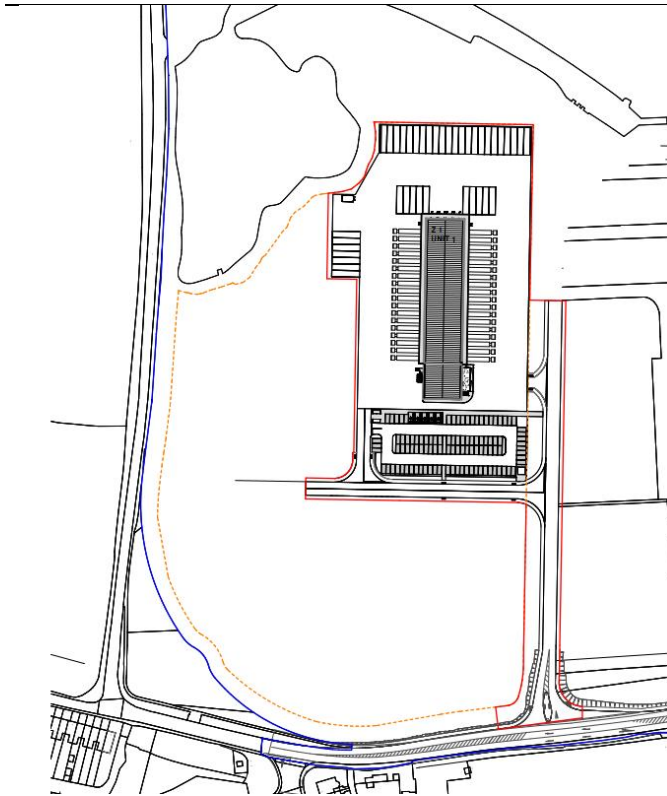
Application ERE/0423/0018 – Plot 1, Unit 1 New Stanton Park - Site Location Plan
